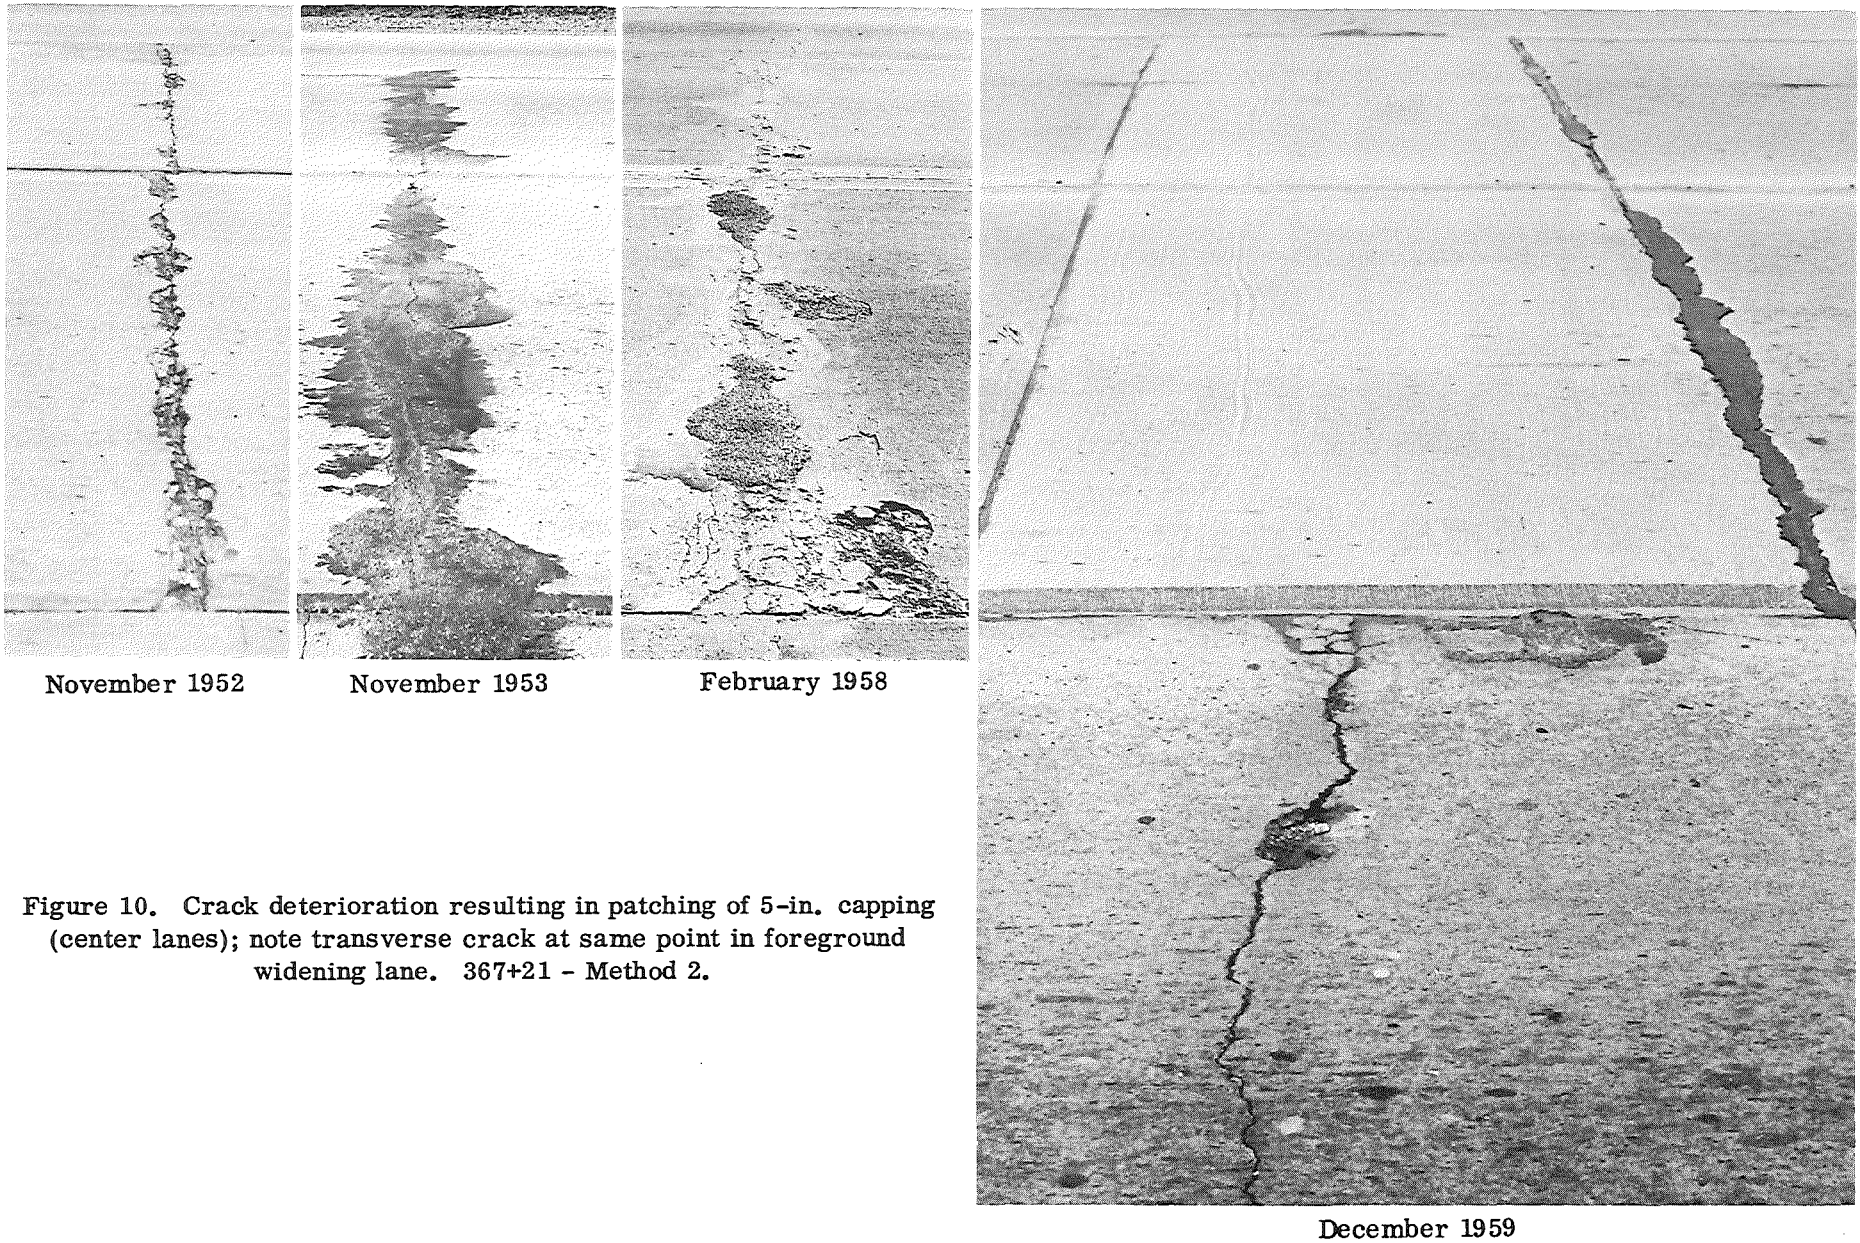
Crack deterioration resulting in patching of 5-in. capping (center lanes); note transverse crack at same point in foreground widening lane. 367+21 - Method 2.
